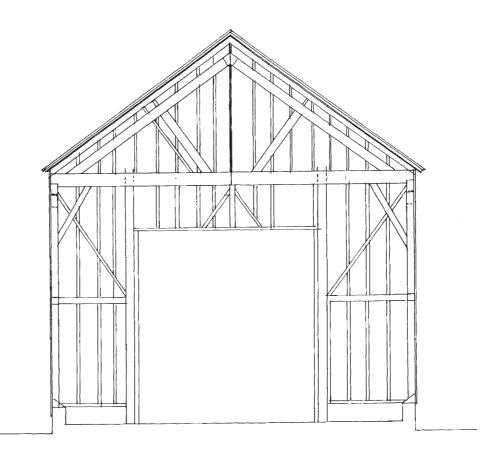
Barn (E) and attached building (D): elevations - north-west and south-east.
